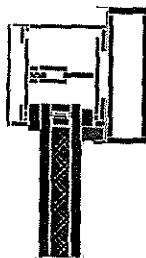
Detail and FRAME model of the curtain wall horizontal mullion.
